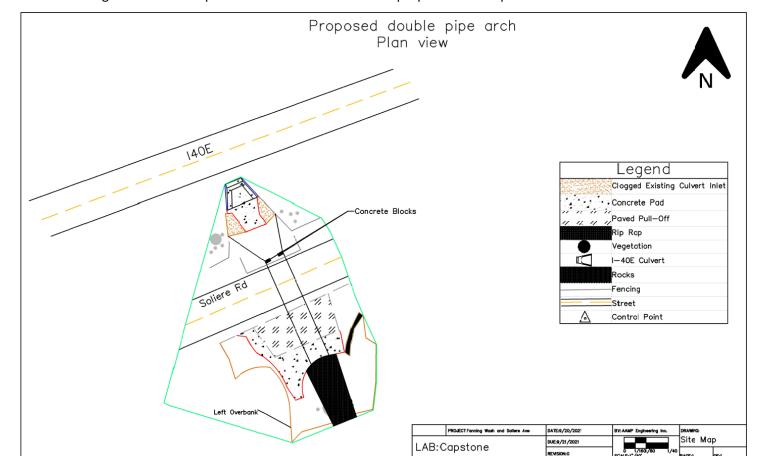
shows a plan view with the blocks in the purposed site map.
